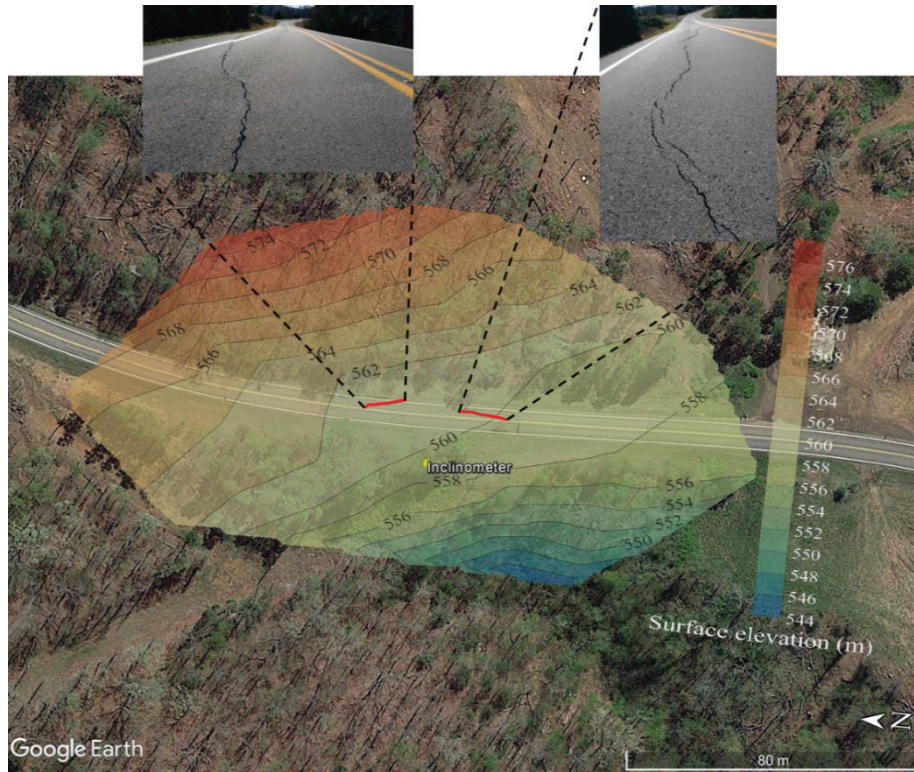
Surface elevation contour map across the Sand Gap site along with the cracks observed in the pavement.
